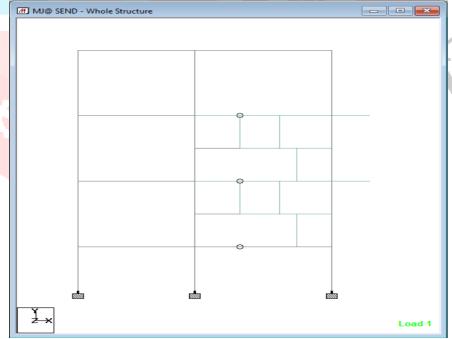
Elevation of the G+1 DUPLEX HOUSE USING
